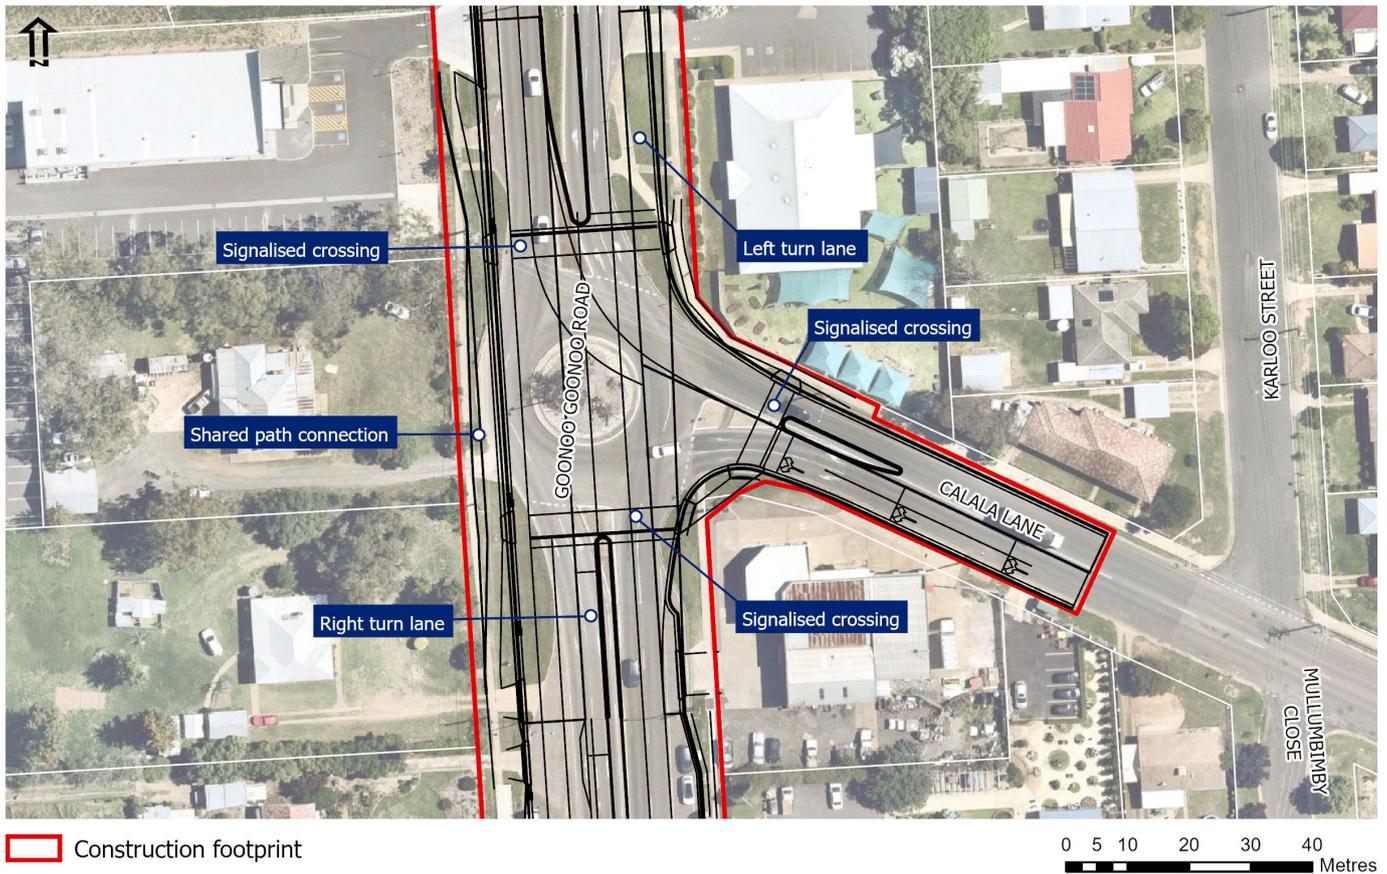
Proposed traffic lights at Goonoo Goonoo Road / Calala Lane intersection
